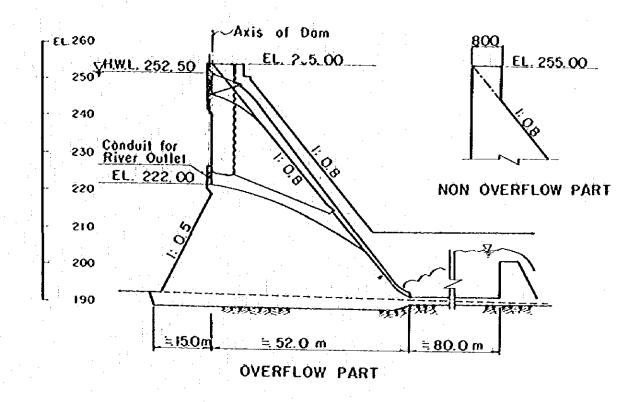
CROSS SECTION AND PROFILE OF KOMERING NO. 2 DAM
